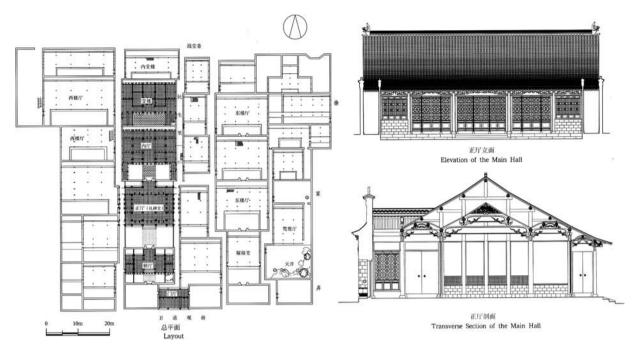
The plan layout, elevation and section of a traditional house complex in the city (The Real Estate Management Bureau of Suzhou, 2004, p. 218–219).
